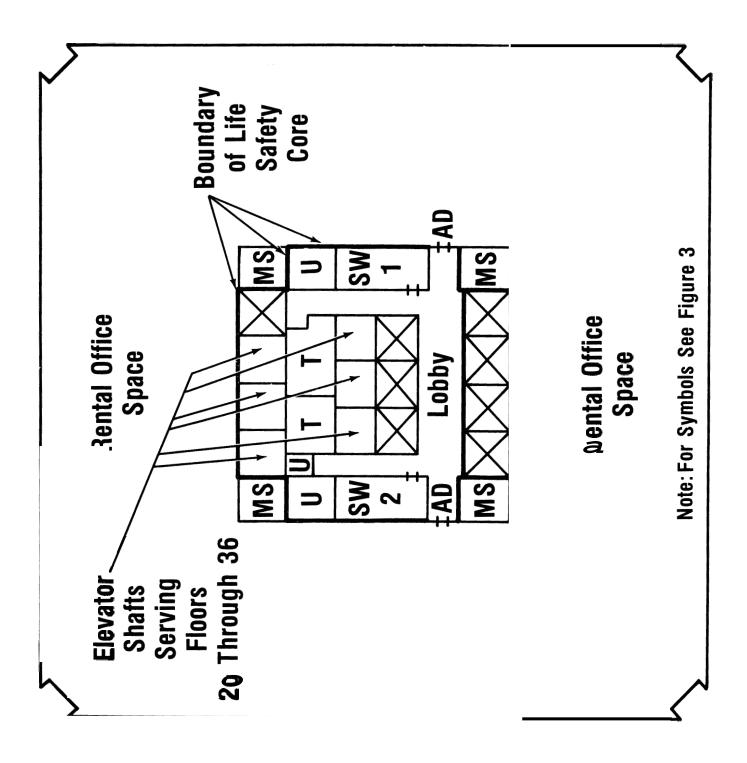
Typical Floor Plan for Floors 3 through 19 of Building 5
